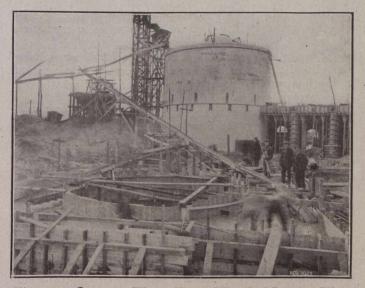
Concrete Work Under Way for Suction Well. Portion of Chemical Store Building in Background.
